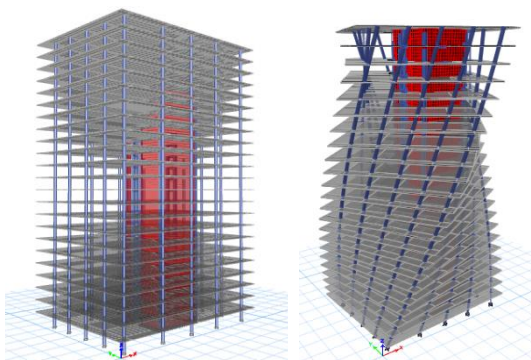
3-D Finite Element Model of the Prismatic and Twisted Tall Building Structures
